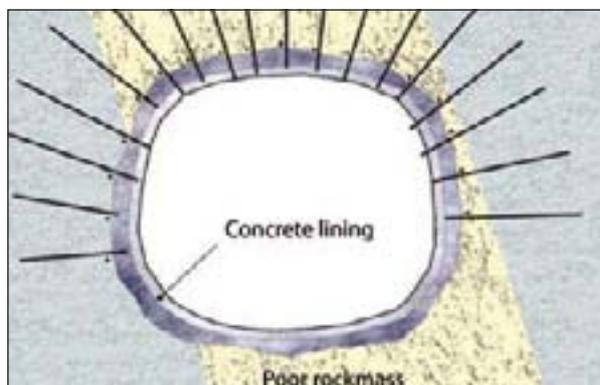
Example b), temporary support by pre-bolting, radial bolts and sprayed concrete. Permanent support by in-situ concrete lining
